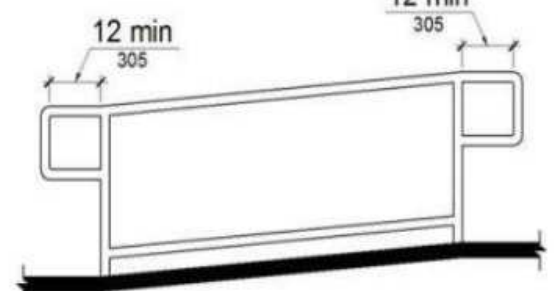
B-505.10.1 TOP AND BOTTOM HANDRAIL EXTENSION AT RAMPS
